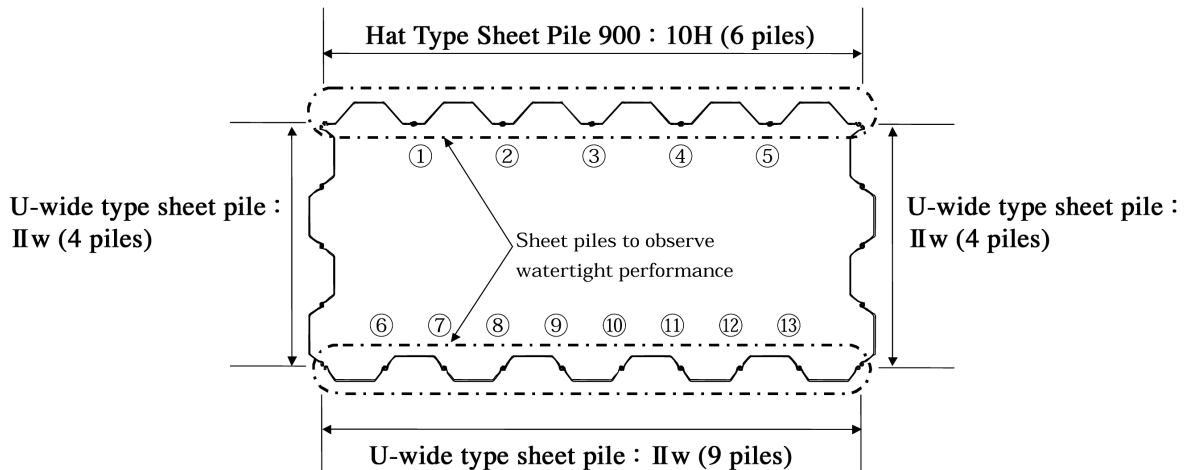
Sheet pile arrangement of field test to observe watertight performance
